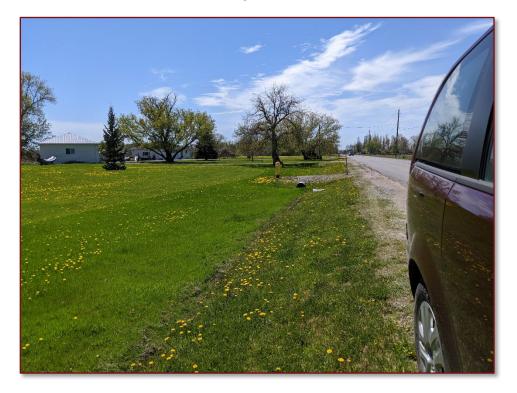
Wyman Road between York and Lower Slash Roads – Wooded Area
